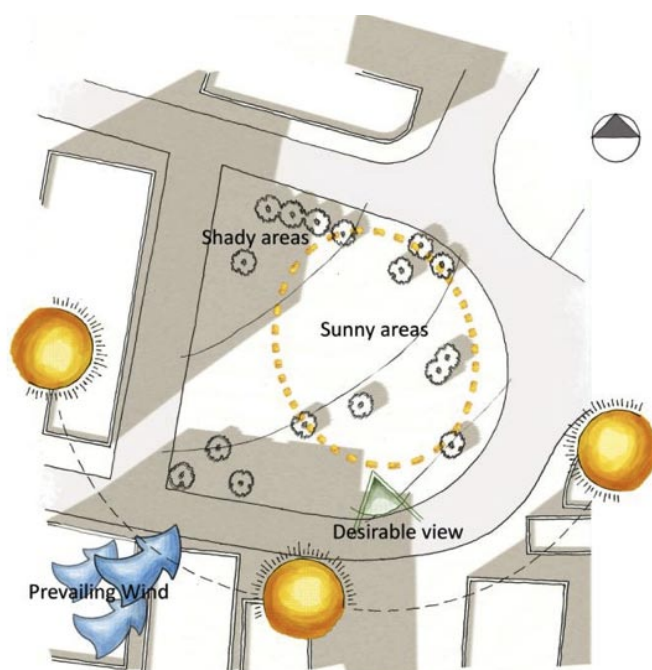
A site plan showing site characteristics (views, wind, sun and shade patterns, etc.).
